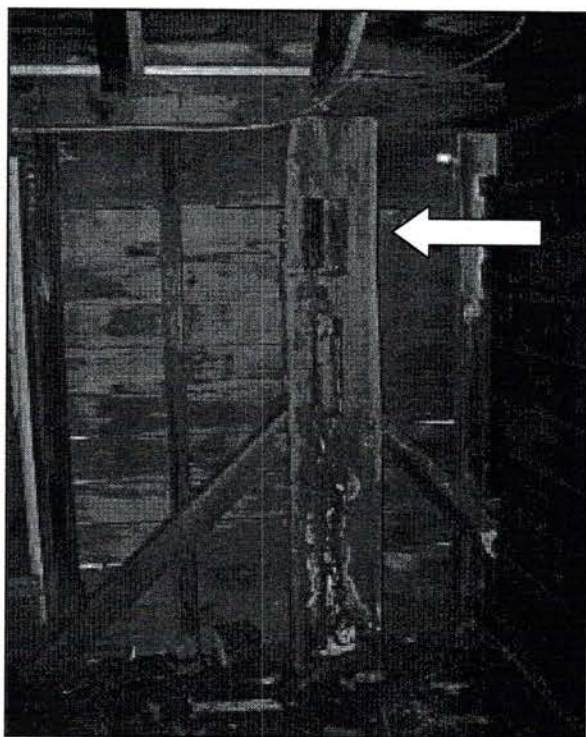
Recycled timber framing on the second floor of the Carriage House with unused mortise.
